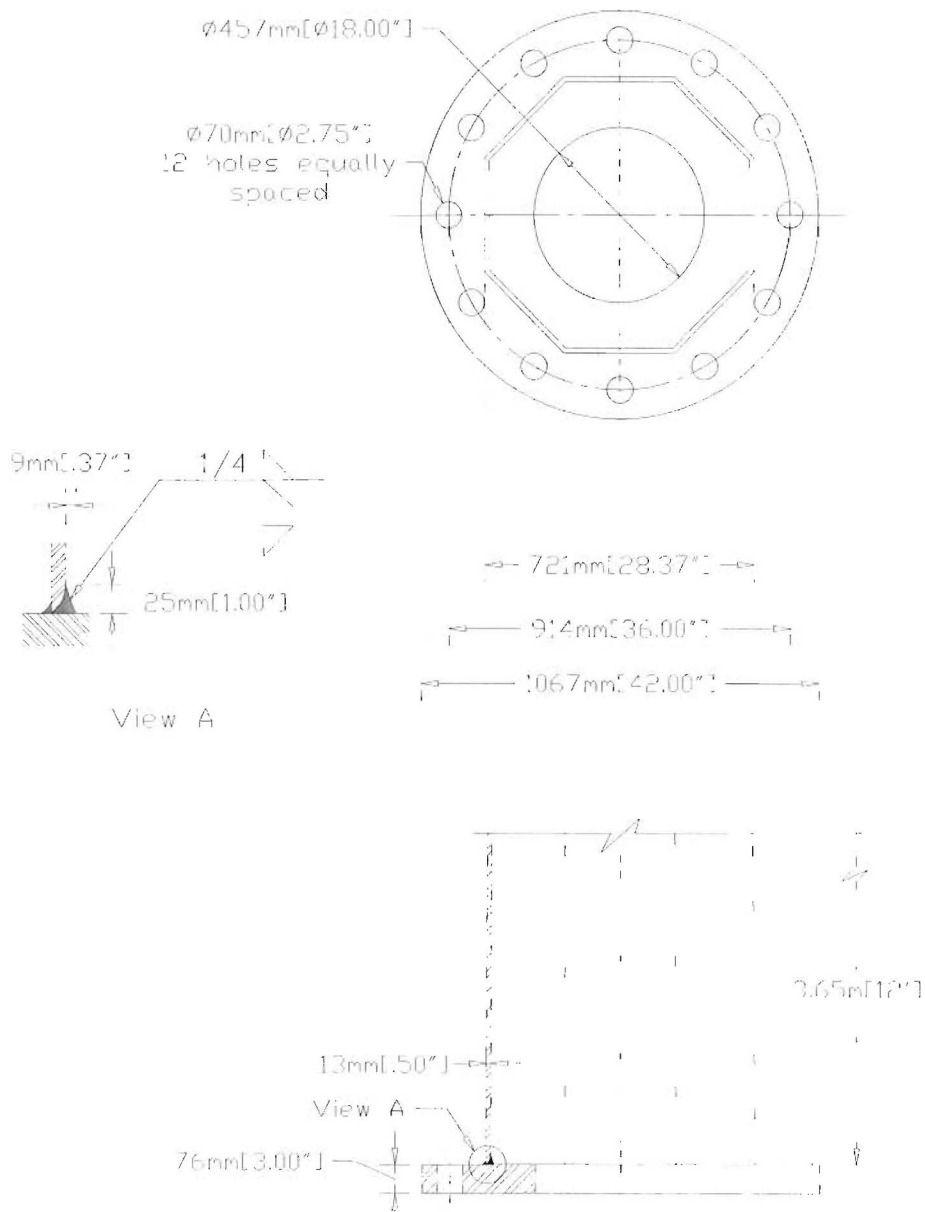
Schematic drawing of HMIP specimen used in laboratory study.
